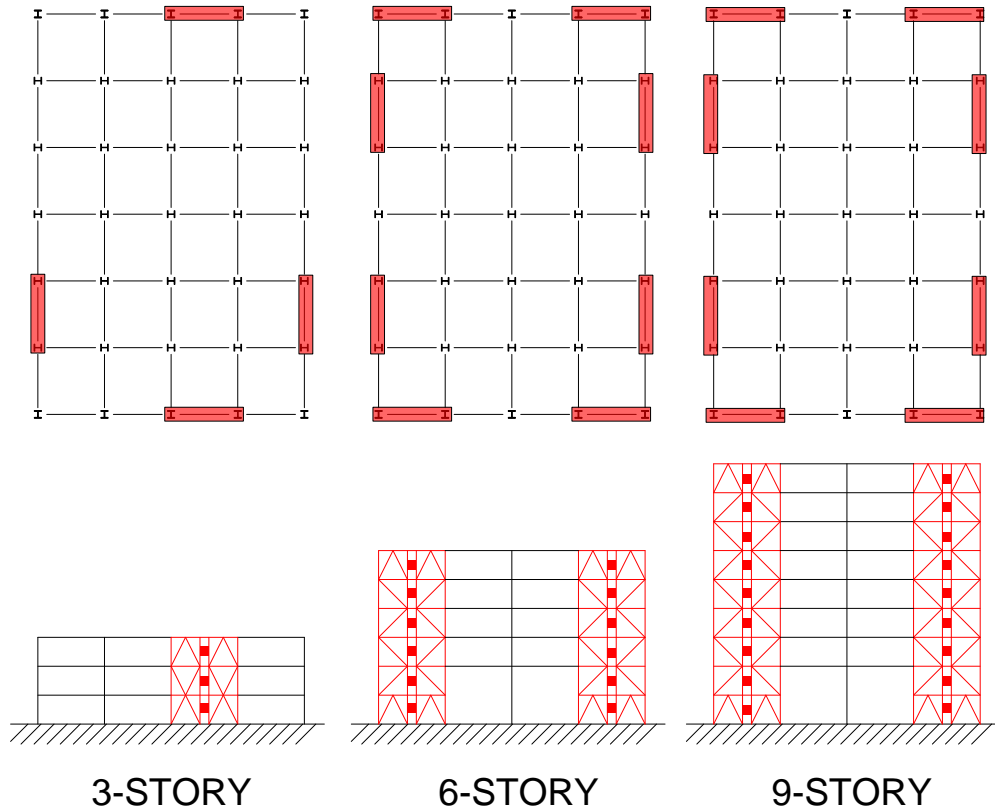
Building Plans and Elevations Used in the Sensitivity Study
